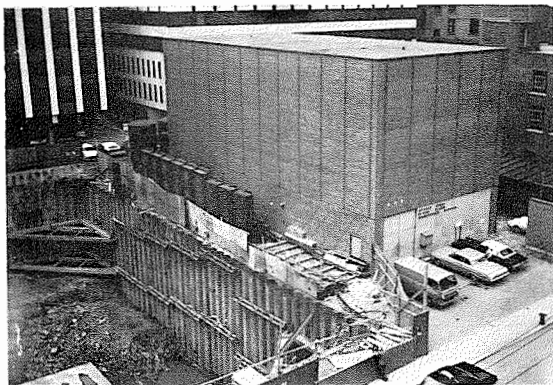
View of tied-back sheet pile wall and adjacent building when excavation was almost complete.
